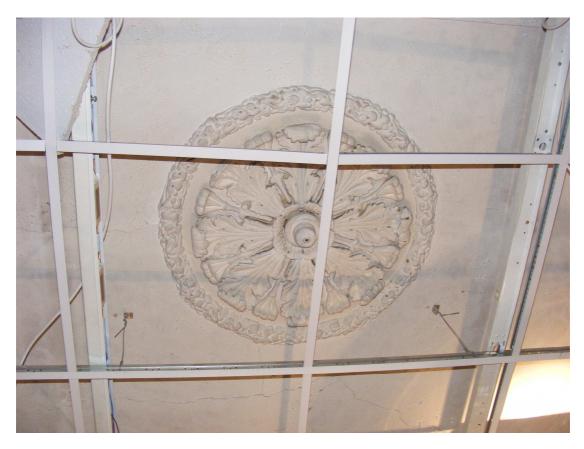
View of centre moulded plaster room 23 (photo 267)
